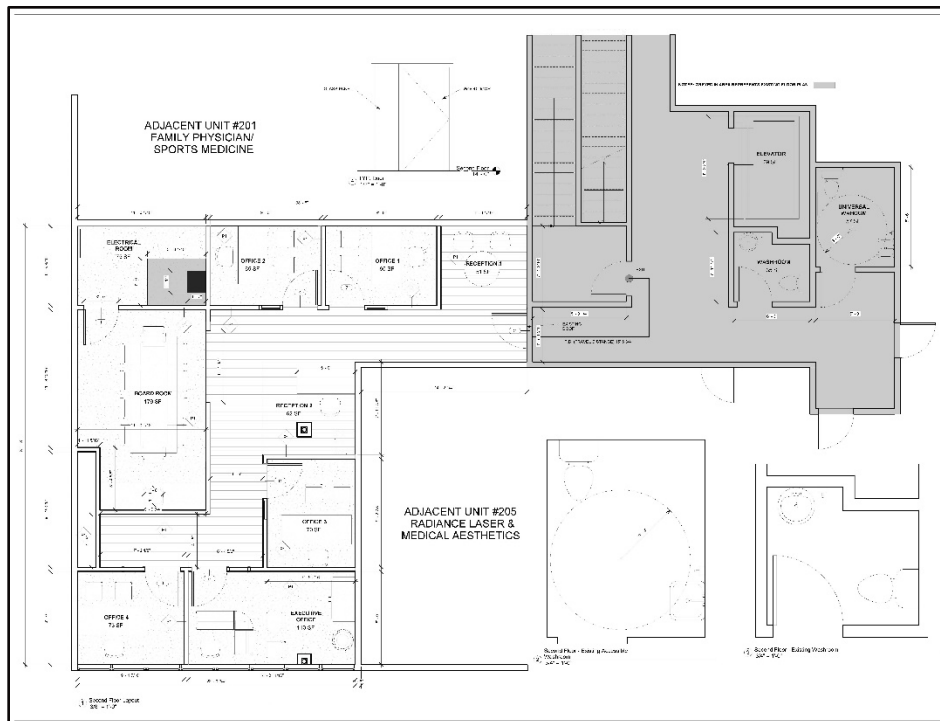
Extended Second Floor Plan (Source: Paulsan Construction Inc. - Drawings)
